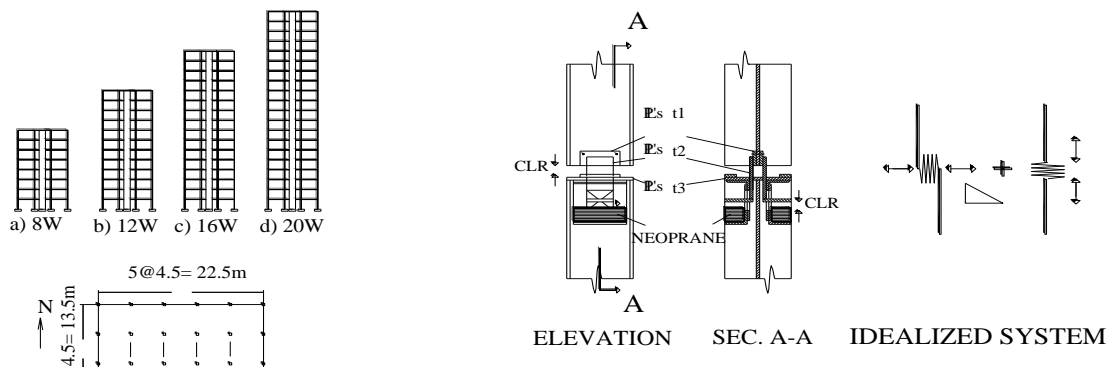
Elevations of SST and details of hinge A2 (Elkordi et al.-1998).
